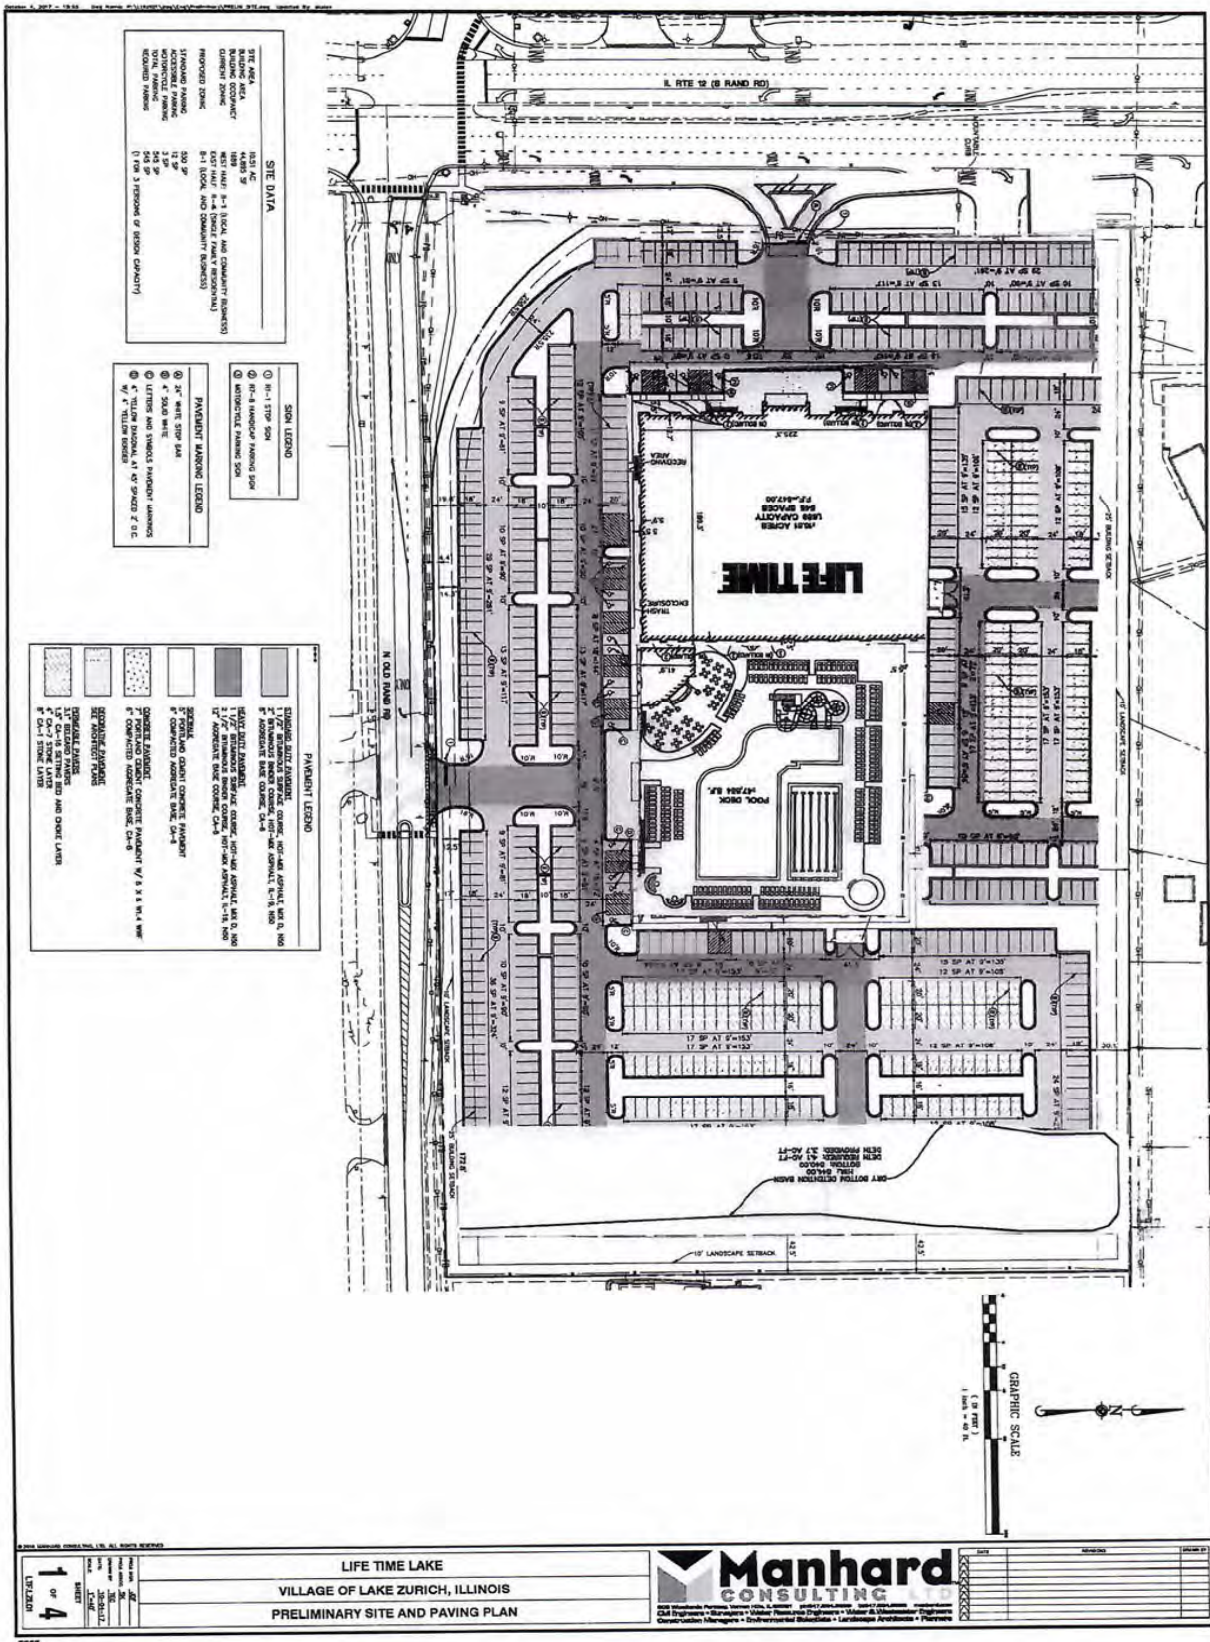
SITE PLAN PROPOSED BY LAKE BREEZE COURT RESIDENTS
